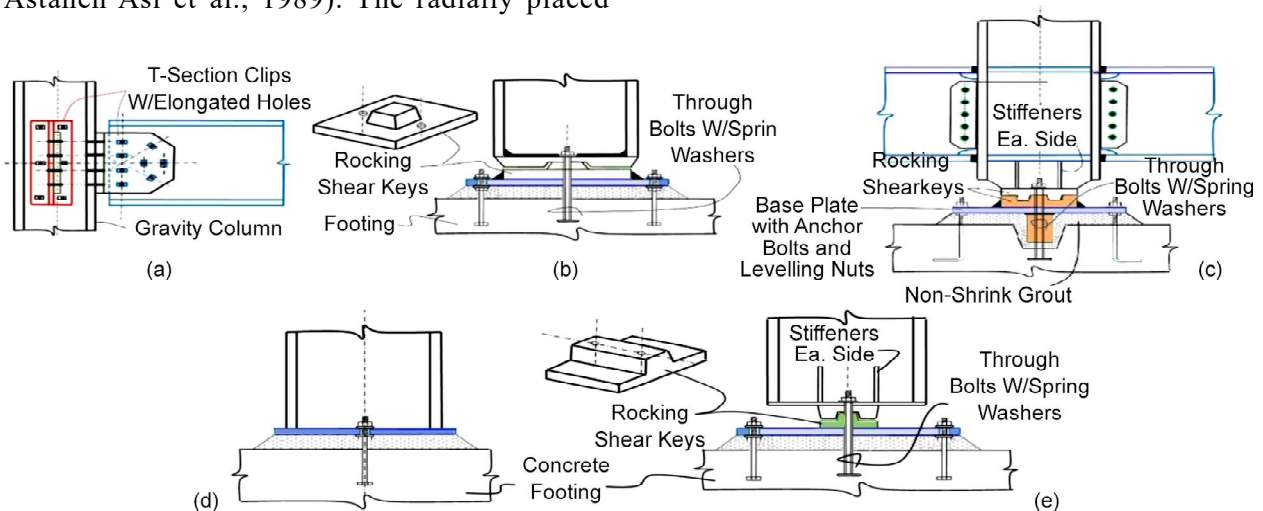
(a) Proposed articulated beam-column joint with torsion release, (b) Proposed two-way rocking pinned base column support, (c) Proposed rocking base column support, partial fixity provided by grade beams, (d) Typical pinned column base and (e) Proposed one-way rocking pinned column support.
